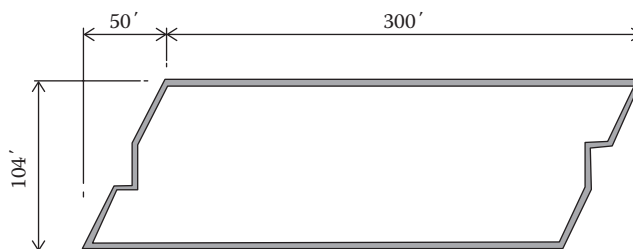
John Hancock Tower, Boston, Plan dimensions.
